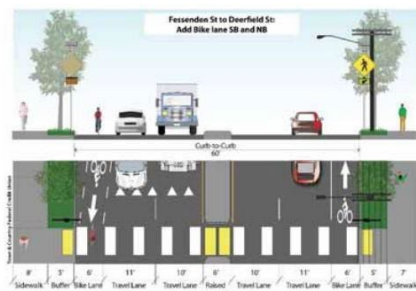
Alternative 1 – Forest Avenue from Deerfield Road to Fessenden Street
